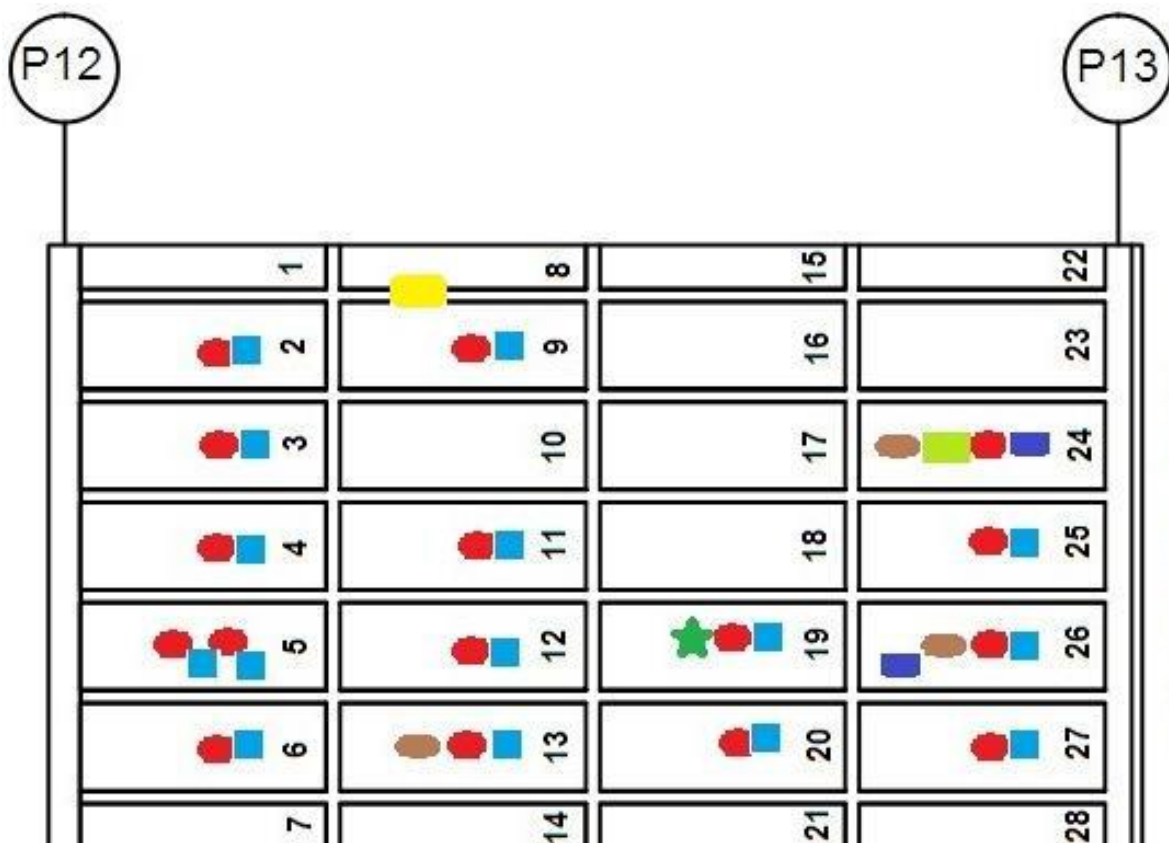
Test conducted at various locations between Pier P12 and Pier P13
